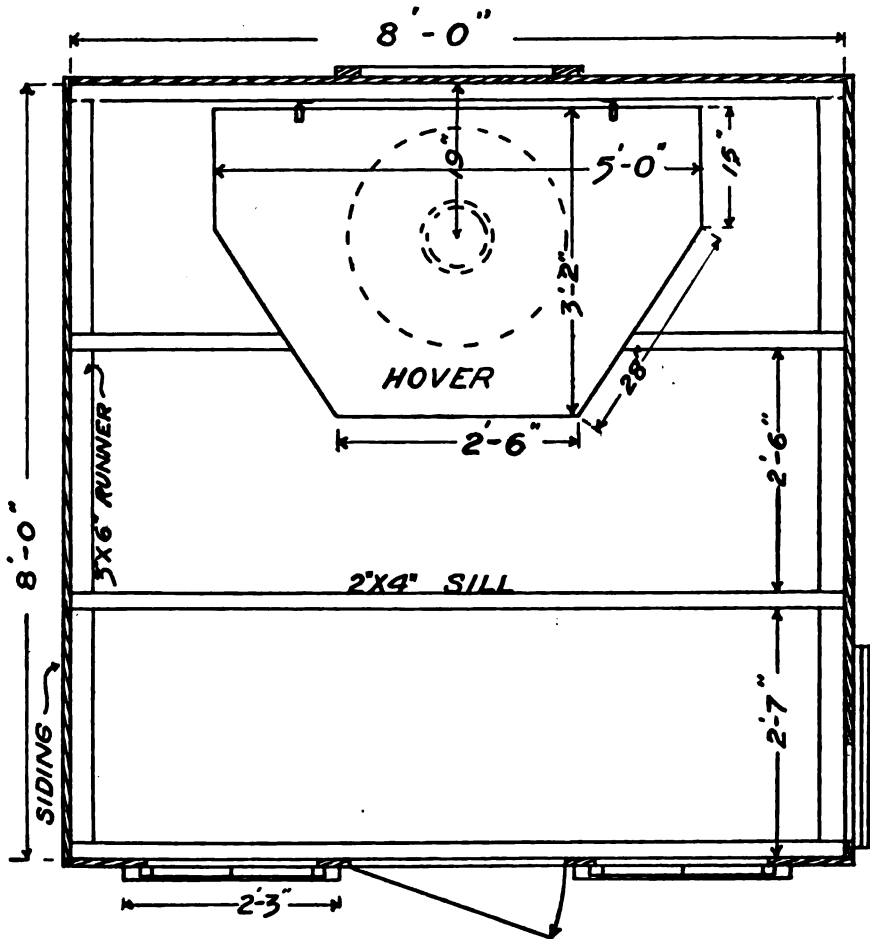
Ground plan of the 8x8-foot colony brooder-house, showing the construction of floor timbers and the position of hover, windows, door, and exit
